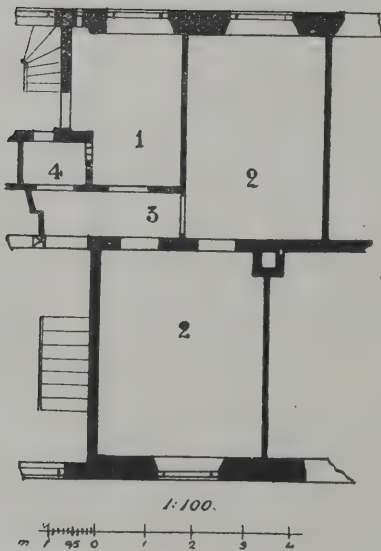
PLAN OF A DWELLING CONSISTING OF TWO ROOMS AND A KITCHEN (*Guldbergsgade*).
